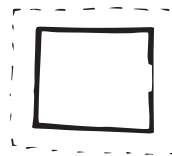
Typical blockhouse (Van Vollenhoven 1999).
